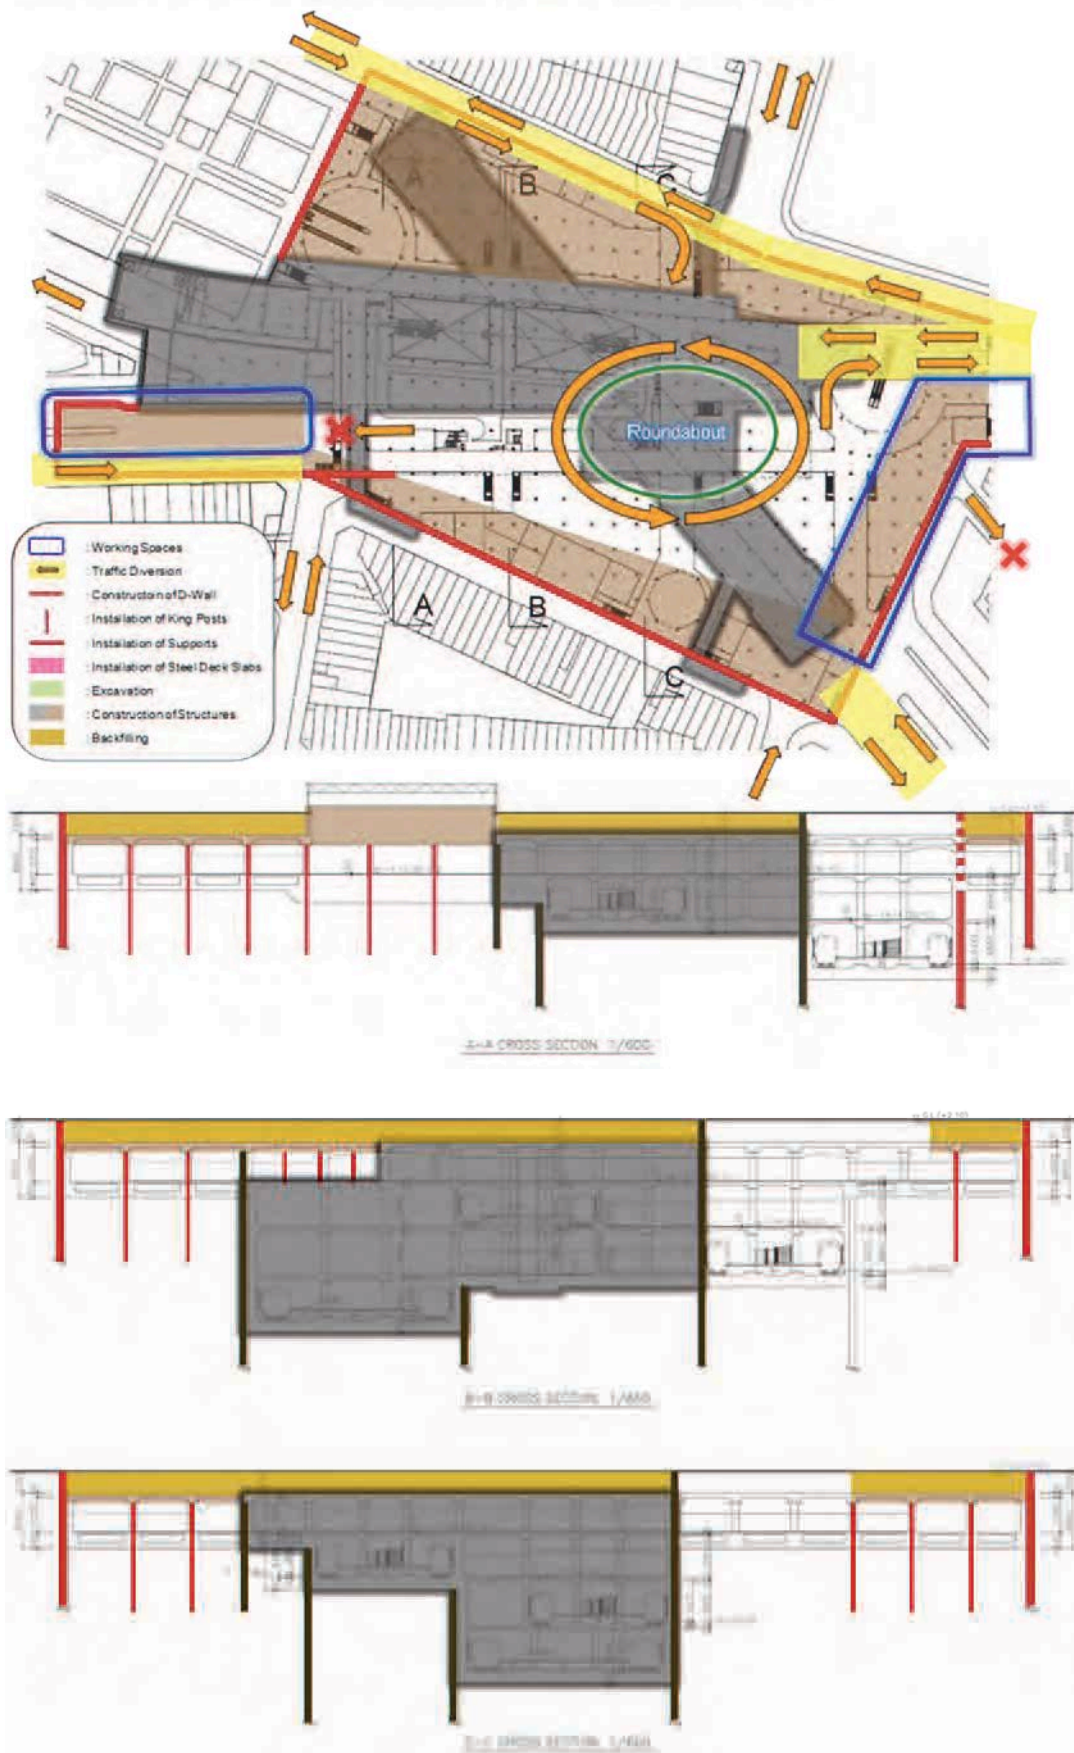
Construction Sequences of Ben Thanh Central Station (18/24)
